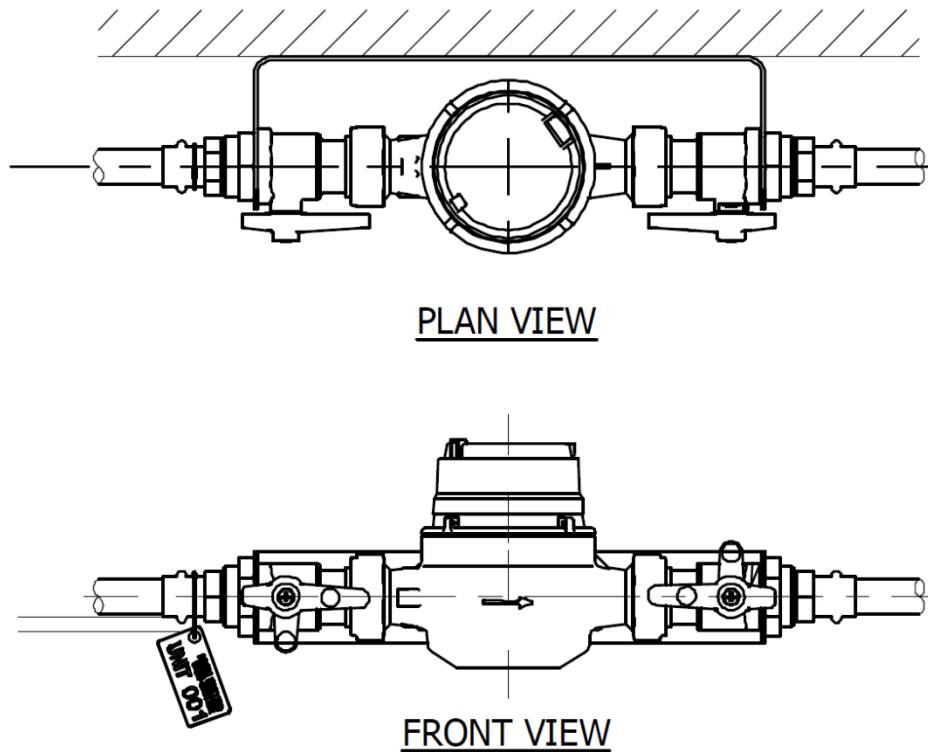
Approved Water Sub-Meter DN20 – Cabinet installation with Stainless Steel or PE bracket
